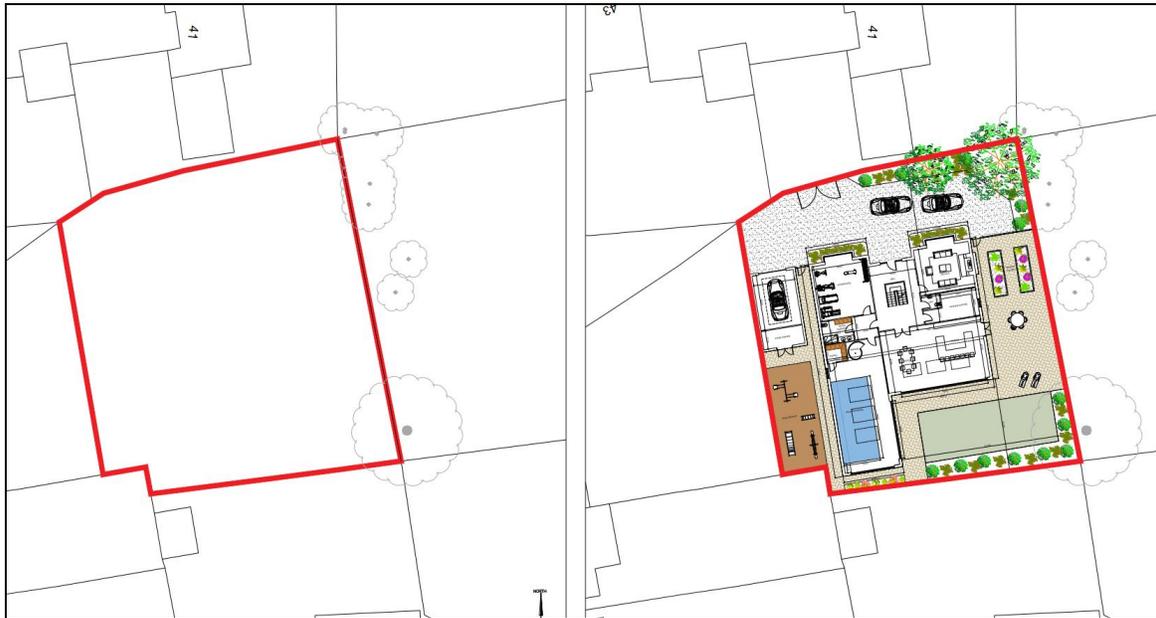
Existing and proposed site plans (©Keith Davidson Partnership).
